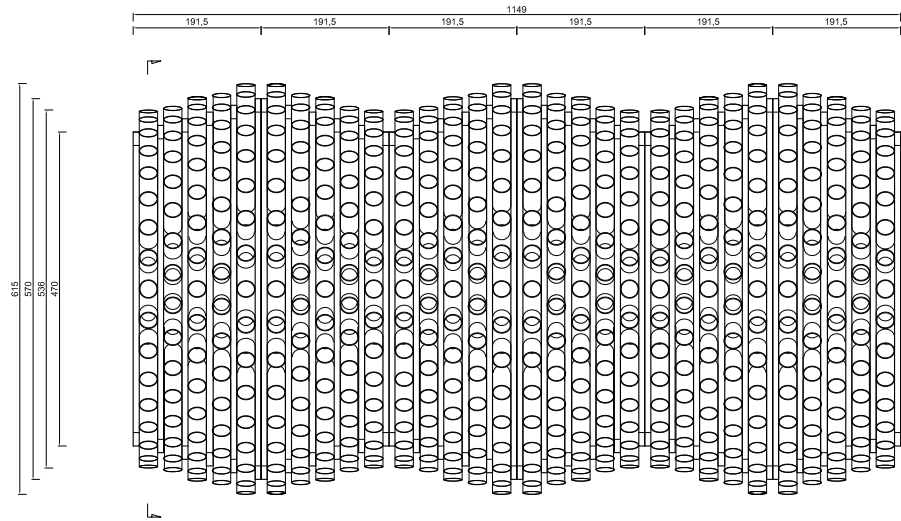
WUST Pavilion, version 3, plan of the pavilion, 2014
